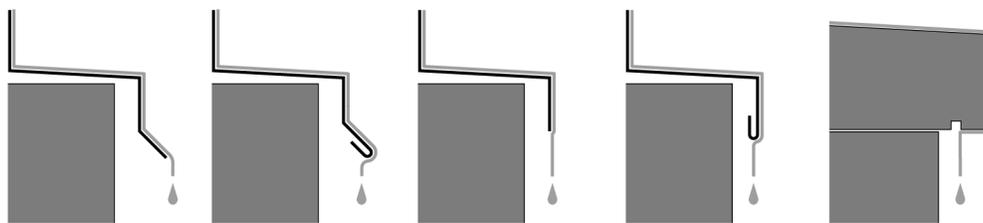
COMMON DRIP EDGE PROFILES: (LEFT TO RIGHT) METAL FLASHING WITH 45° KICK-OUT, METAL FLASHING WITH 45° KICK-OUT WITH HEMMED EDGE, METAL FLASHING WITH 90° BEND, METAL FLASHING WITH 90° BEND AND HEMMED EDGE, AND TYPICAL CONCRETE OR STONE SILL OR CAP WITH THROATING.
